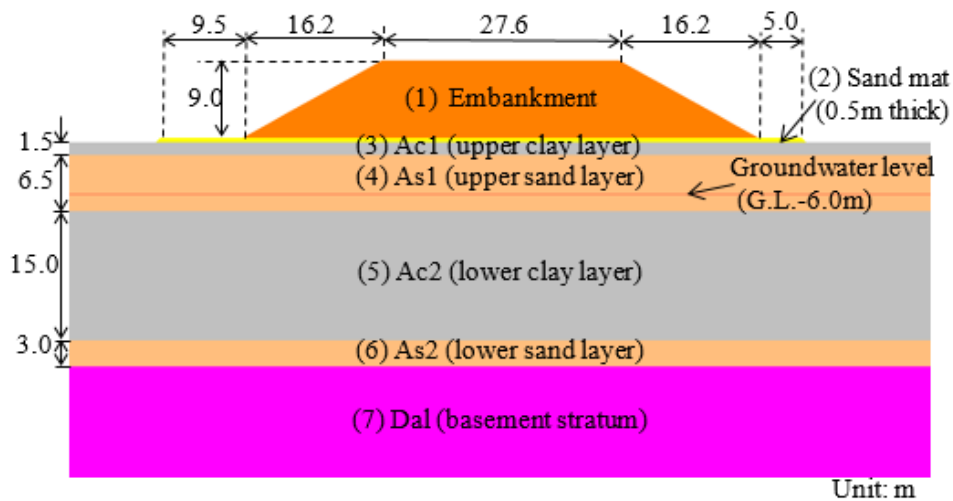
Cross-section of the embankment and the soil profile (Ohta, et al. (2005))
